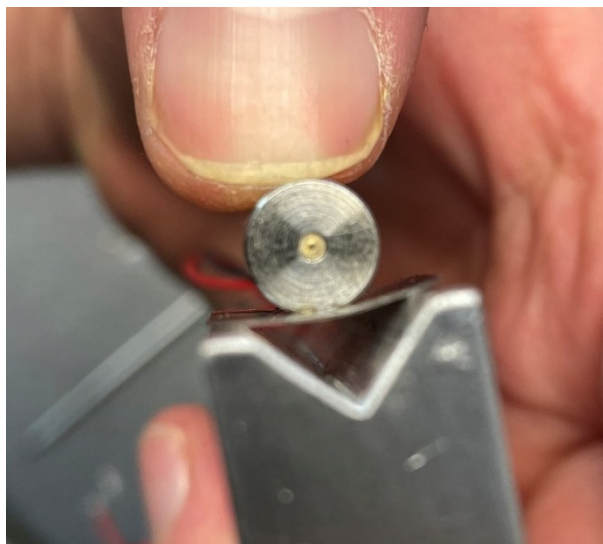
Cover for a spot weldable strain gauge prior to being spot welded onto the structural steel member
